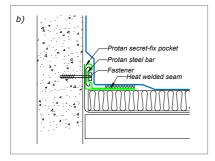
Parapet skirt of Protan roofing membrane with secret pocket welded on fixed to the parapet with Protan steel bar.
